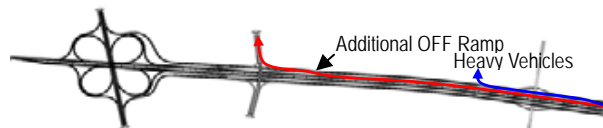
Recommended Modification of the LHLE Connection Plan (Inflow)
